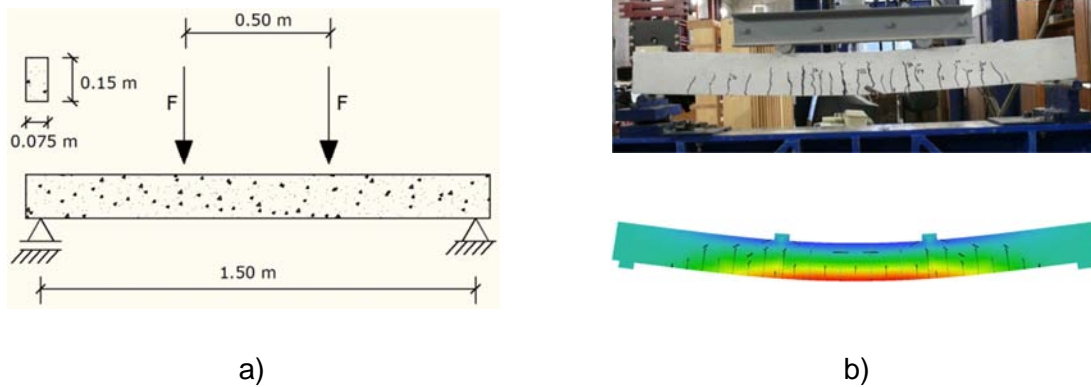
Real application: a) scheme; b) collapse mechanism (top: experimental; bottom: numerical).
